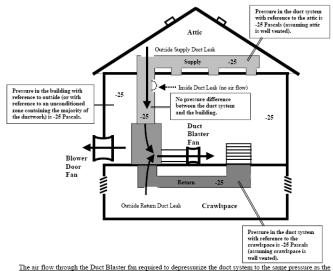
Illustration of leakage to outside depressurization test (at a test pressure of -25 pascals) with duct blaster fan installed at air handler
